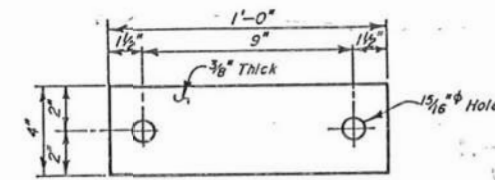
DETAILS OF JOINT MODIFICATION AT ABUTMENTS
